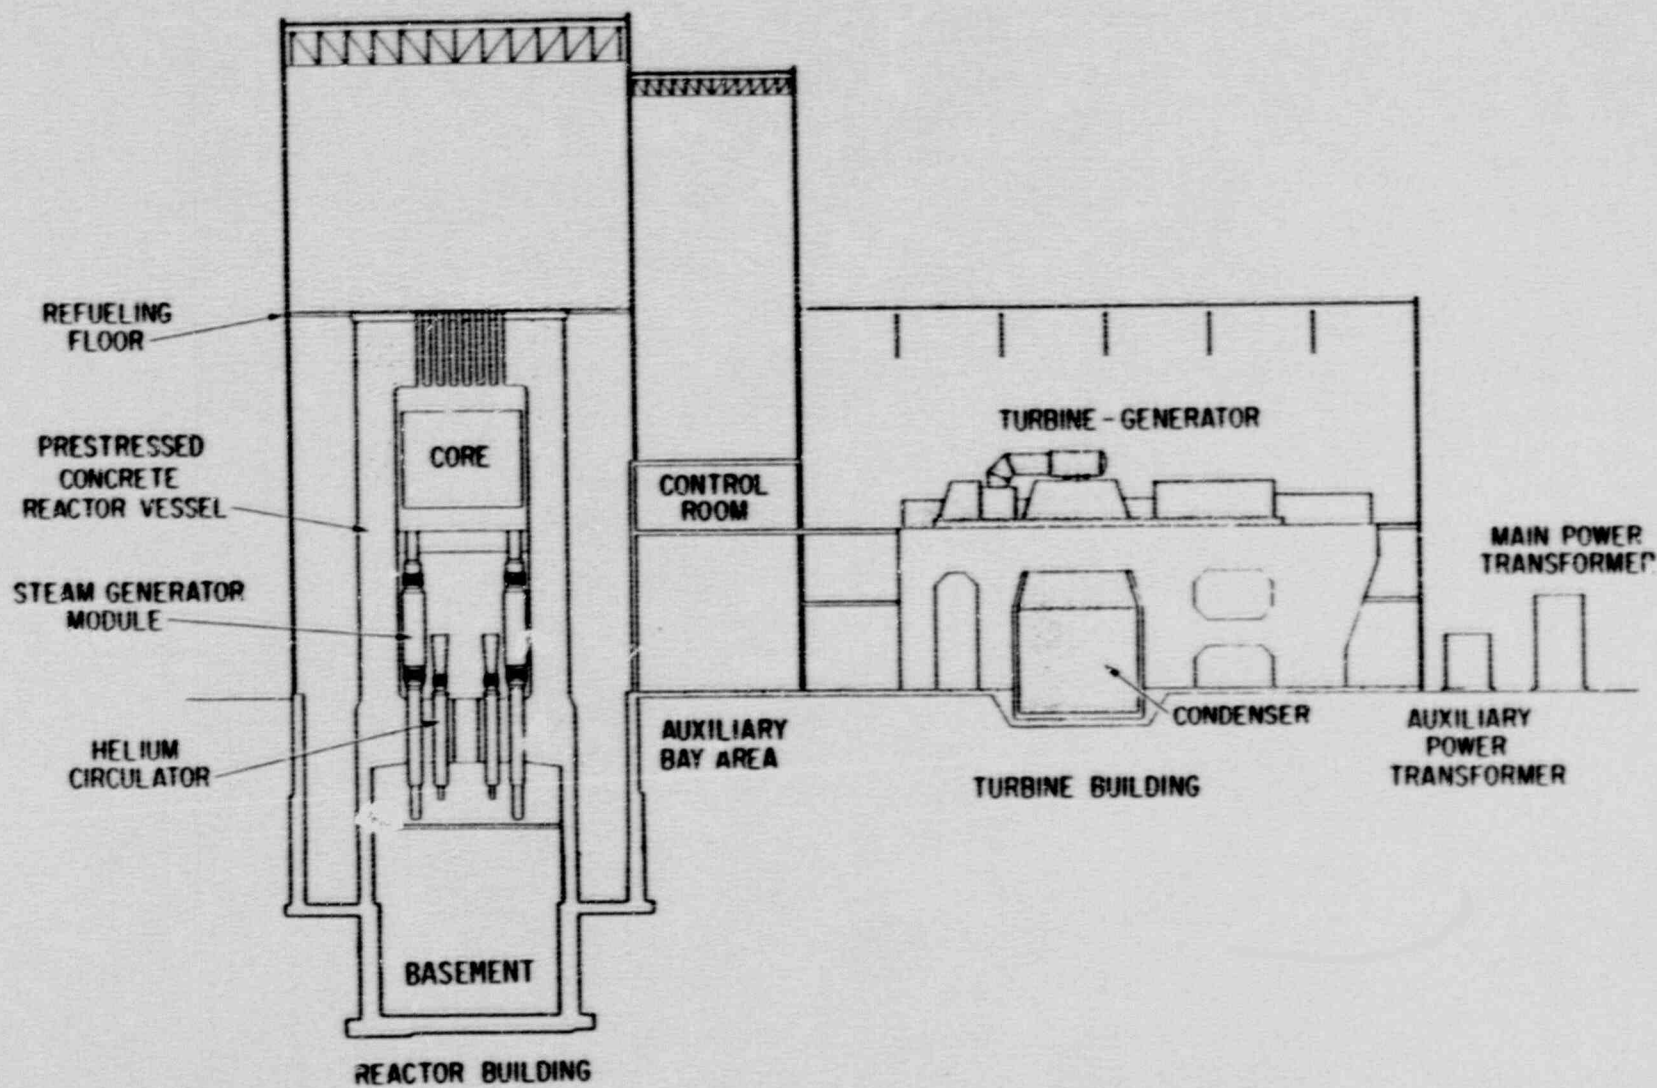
Reactor and Turbine Buildings - Elevation View
